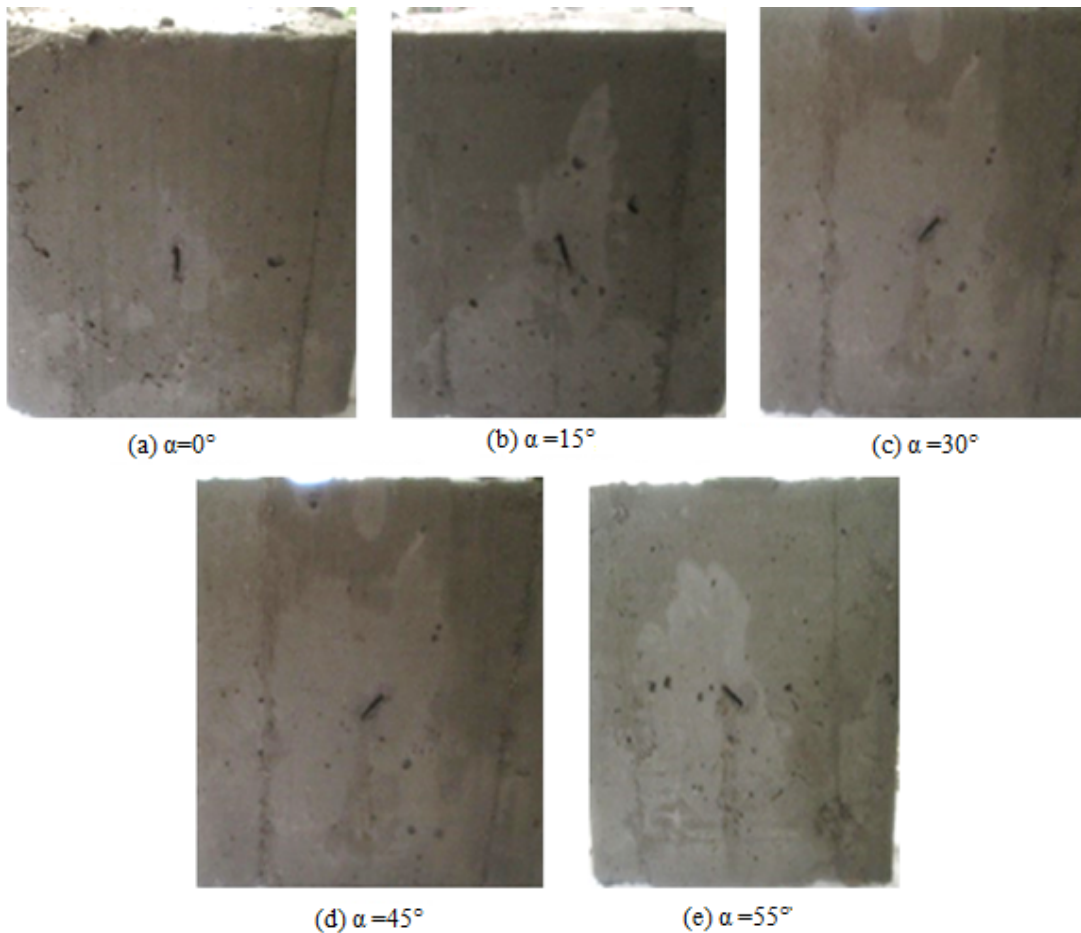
Constructed specimens with a central crack considering different crack inclination angles.
